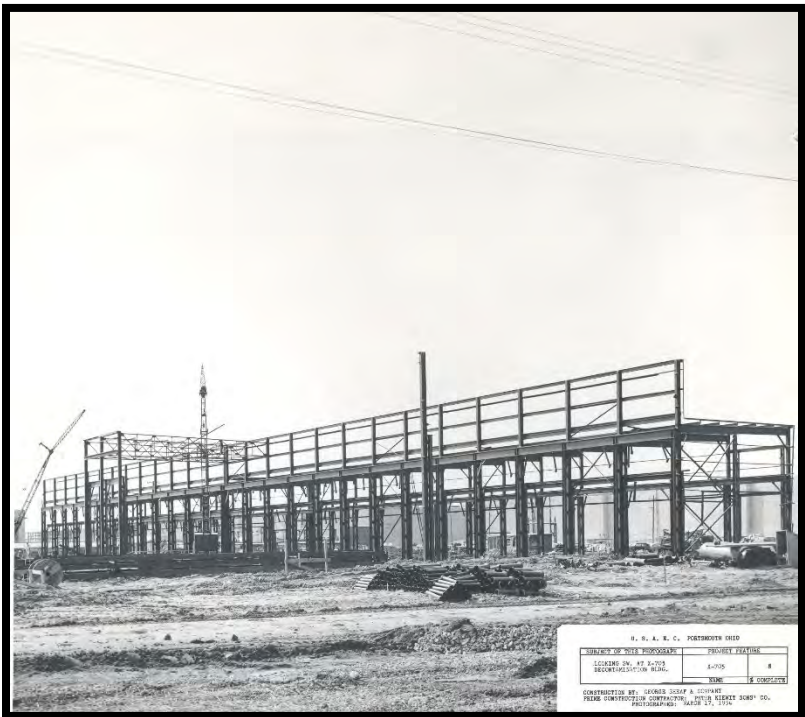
Looking Southwest at the X-705 Decontamination Building, March 1954
